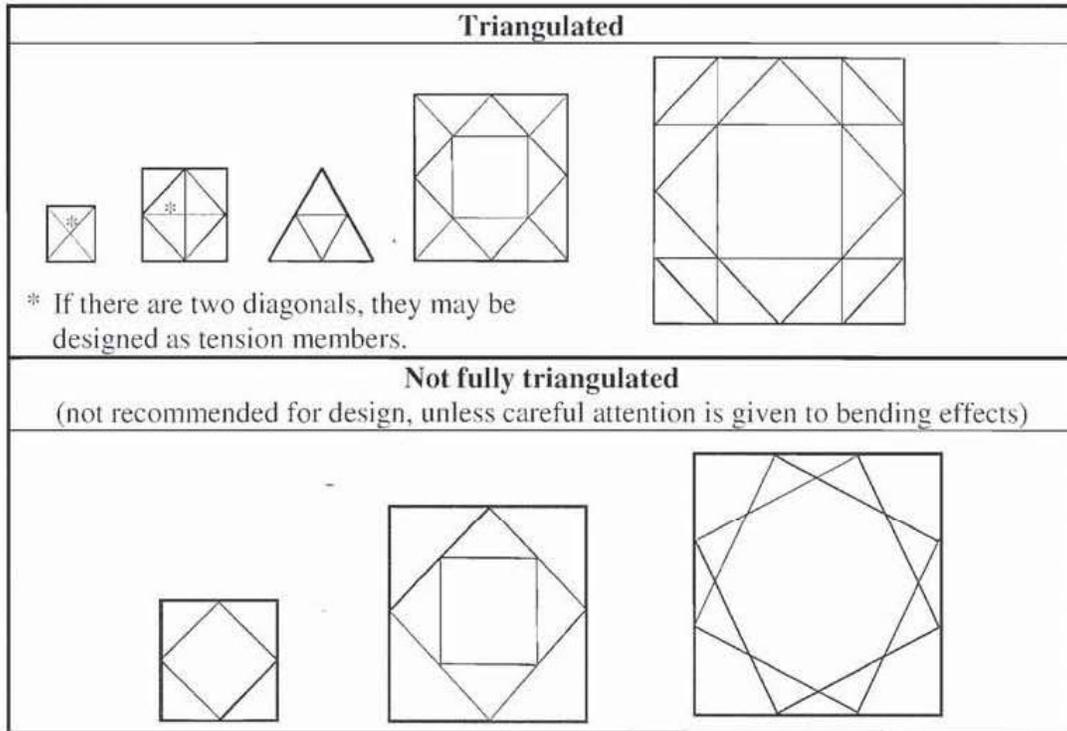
Typical Plan Bracing (EN 1993-3-1:2006)
